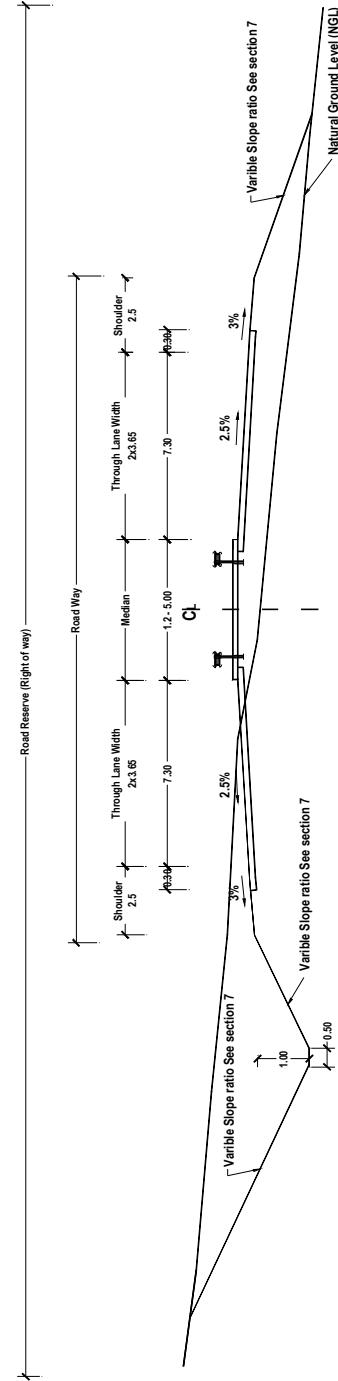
Typical town cross section and values of various cross section elements for Design Classes Paved Ib, II and III roads
